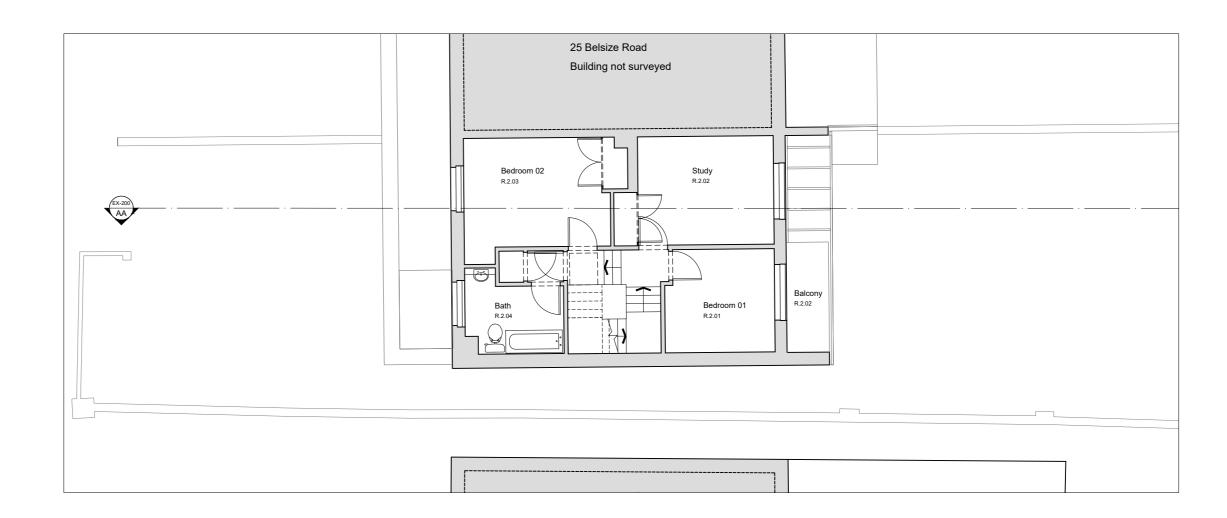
Existing Second Floor Plan - Scale 1:100 @ A3
